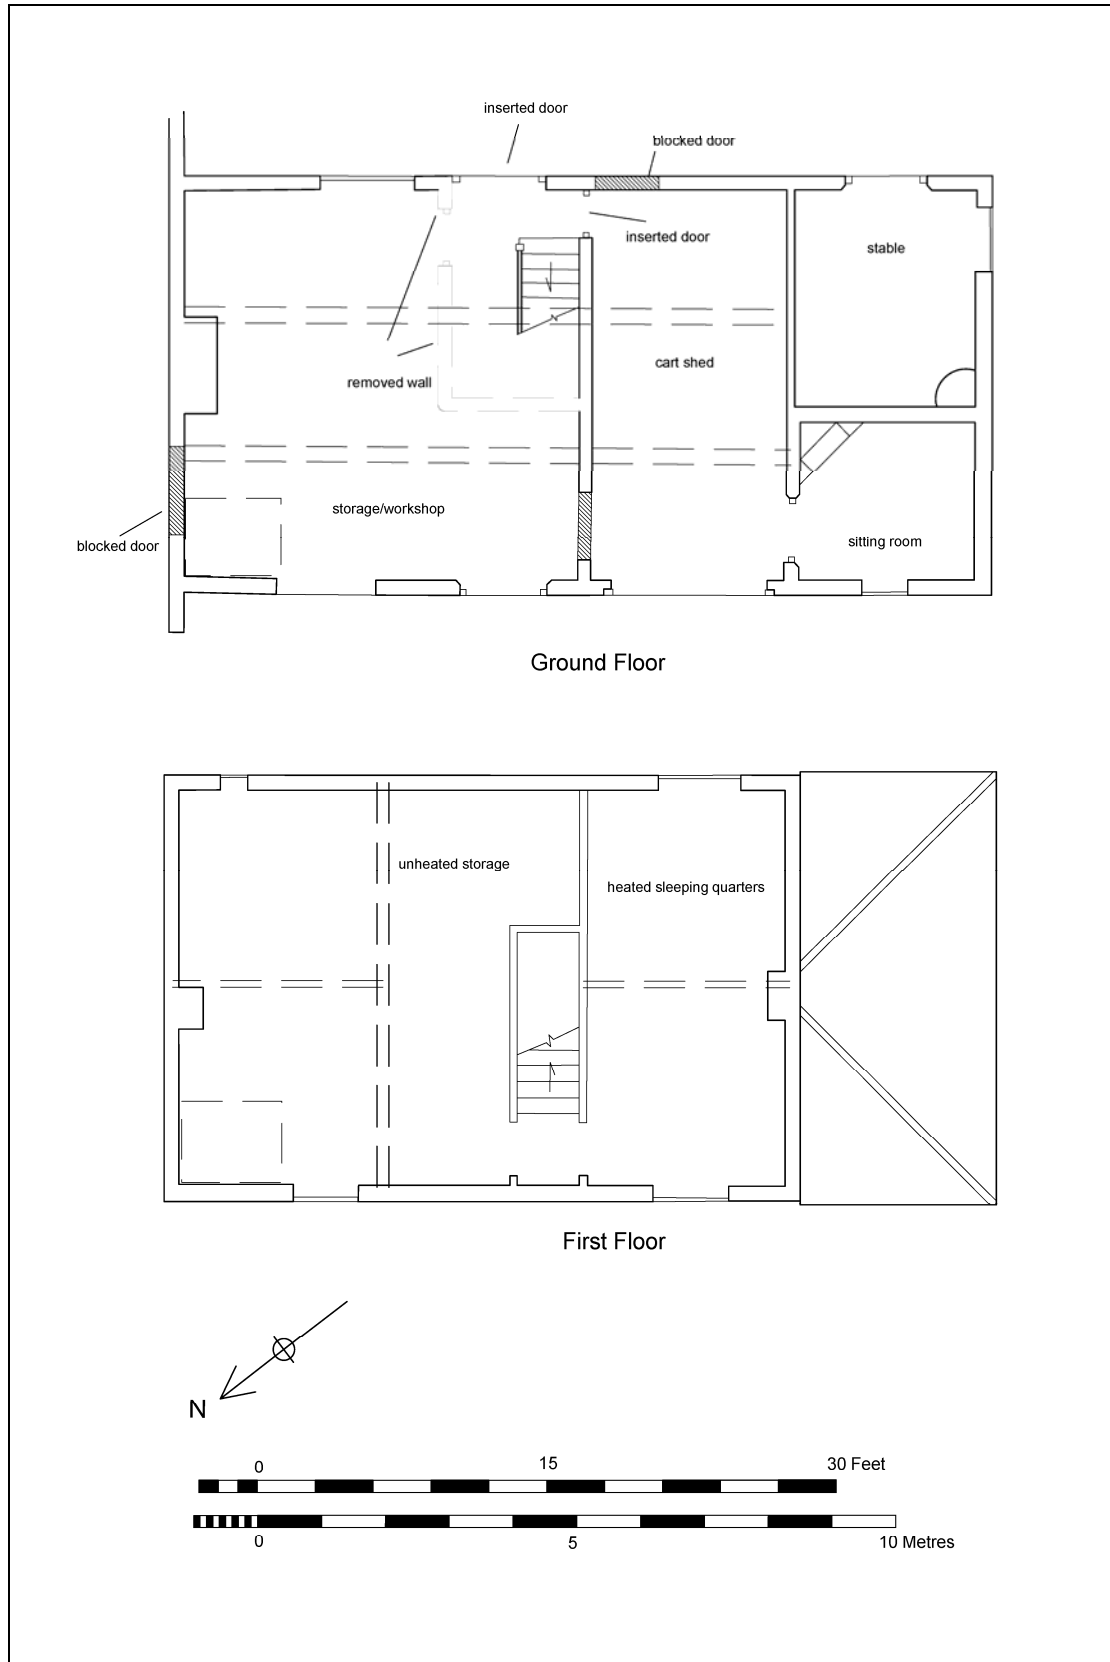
Coach house floor plans, taken from plans supplied by TMCS Architects.
